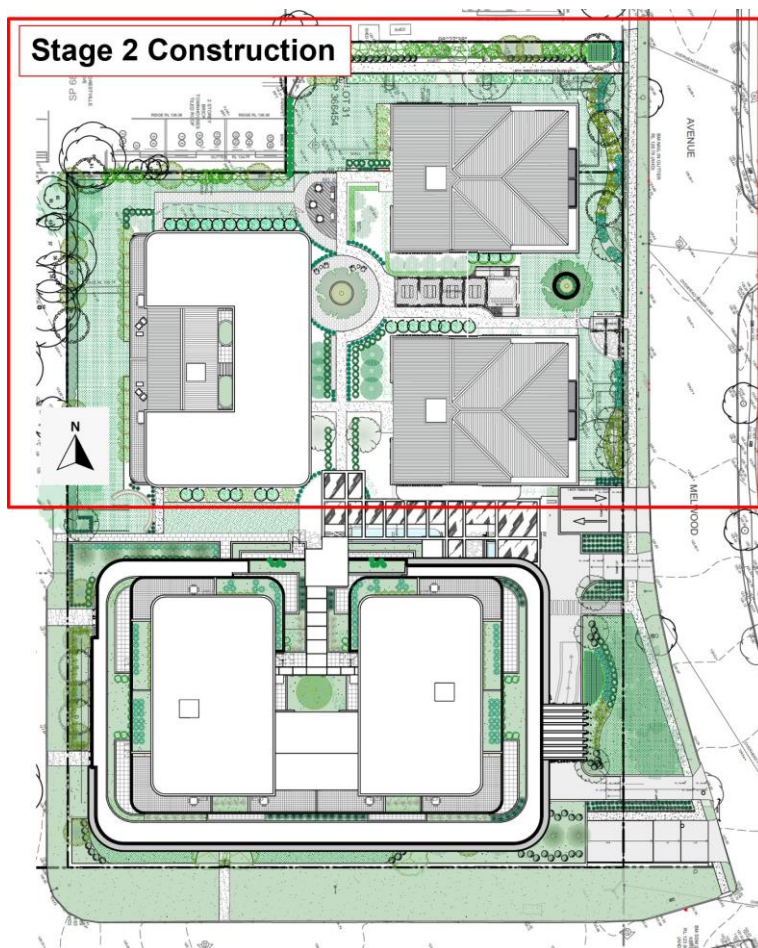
Extract from Site Plan showing Stage 2 Construction for Seniors Housing (Buildings 1, 2 and 3)
